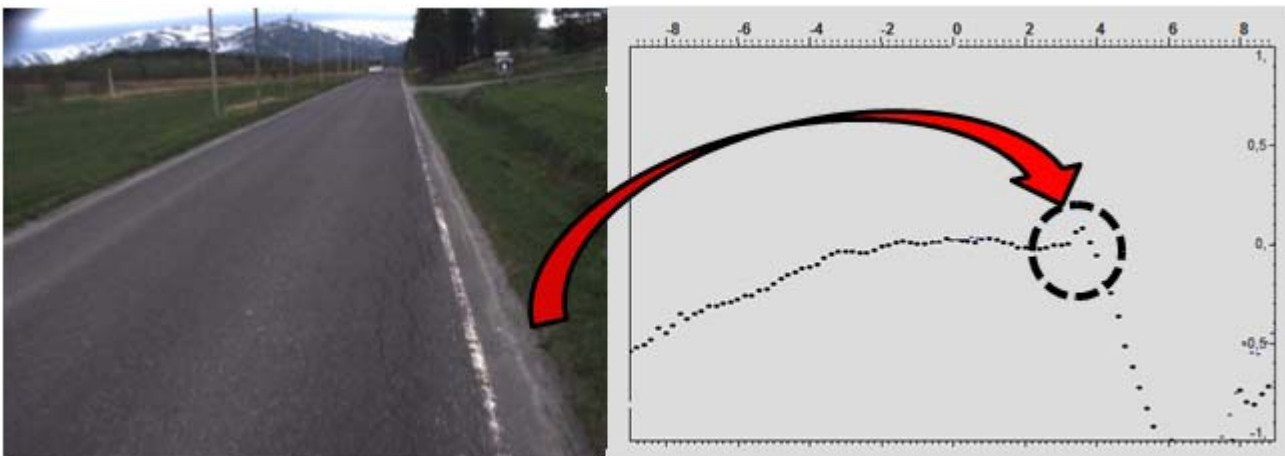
Laser cross section data shows the verge, chainage 24930m. Road cross section shows deformations and the road is dipping to the left.
